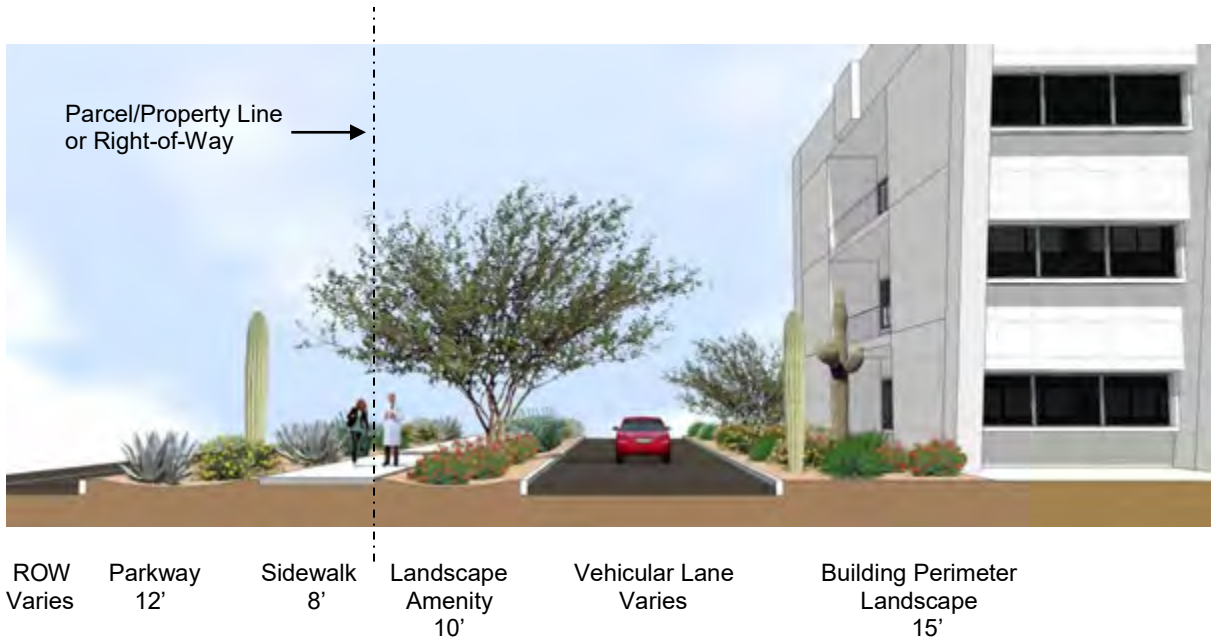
Frontage Building Setback and Landscape Amenity for Internal Drives.
